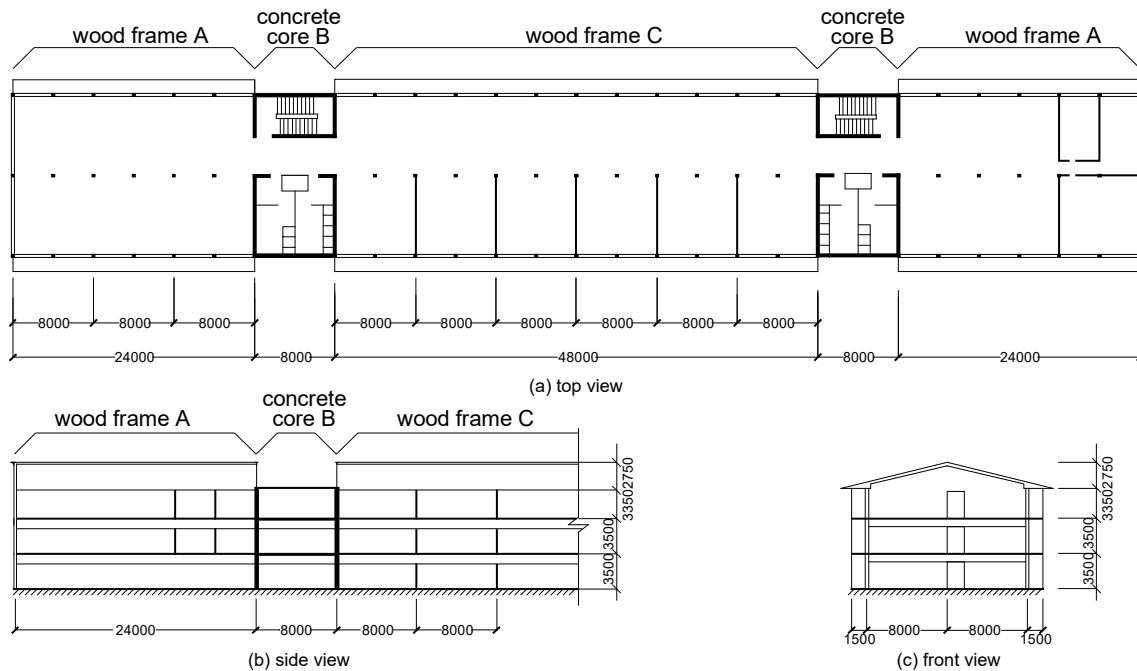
Design prototype of horizontal hybrid structure proposed by AIJ (dimension in millimeters)
